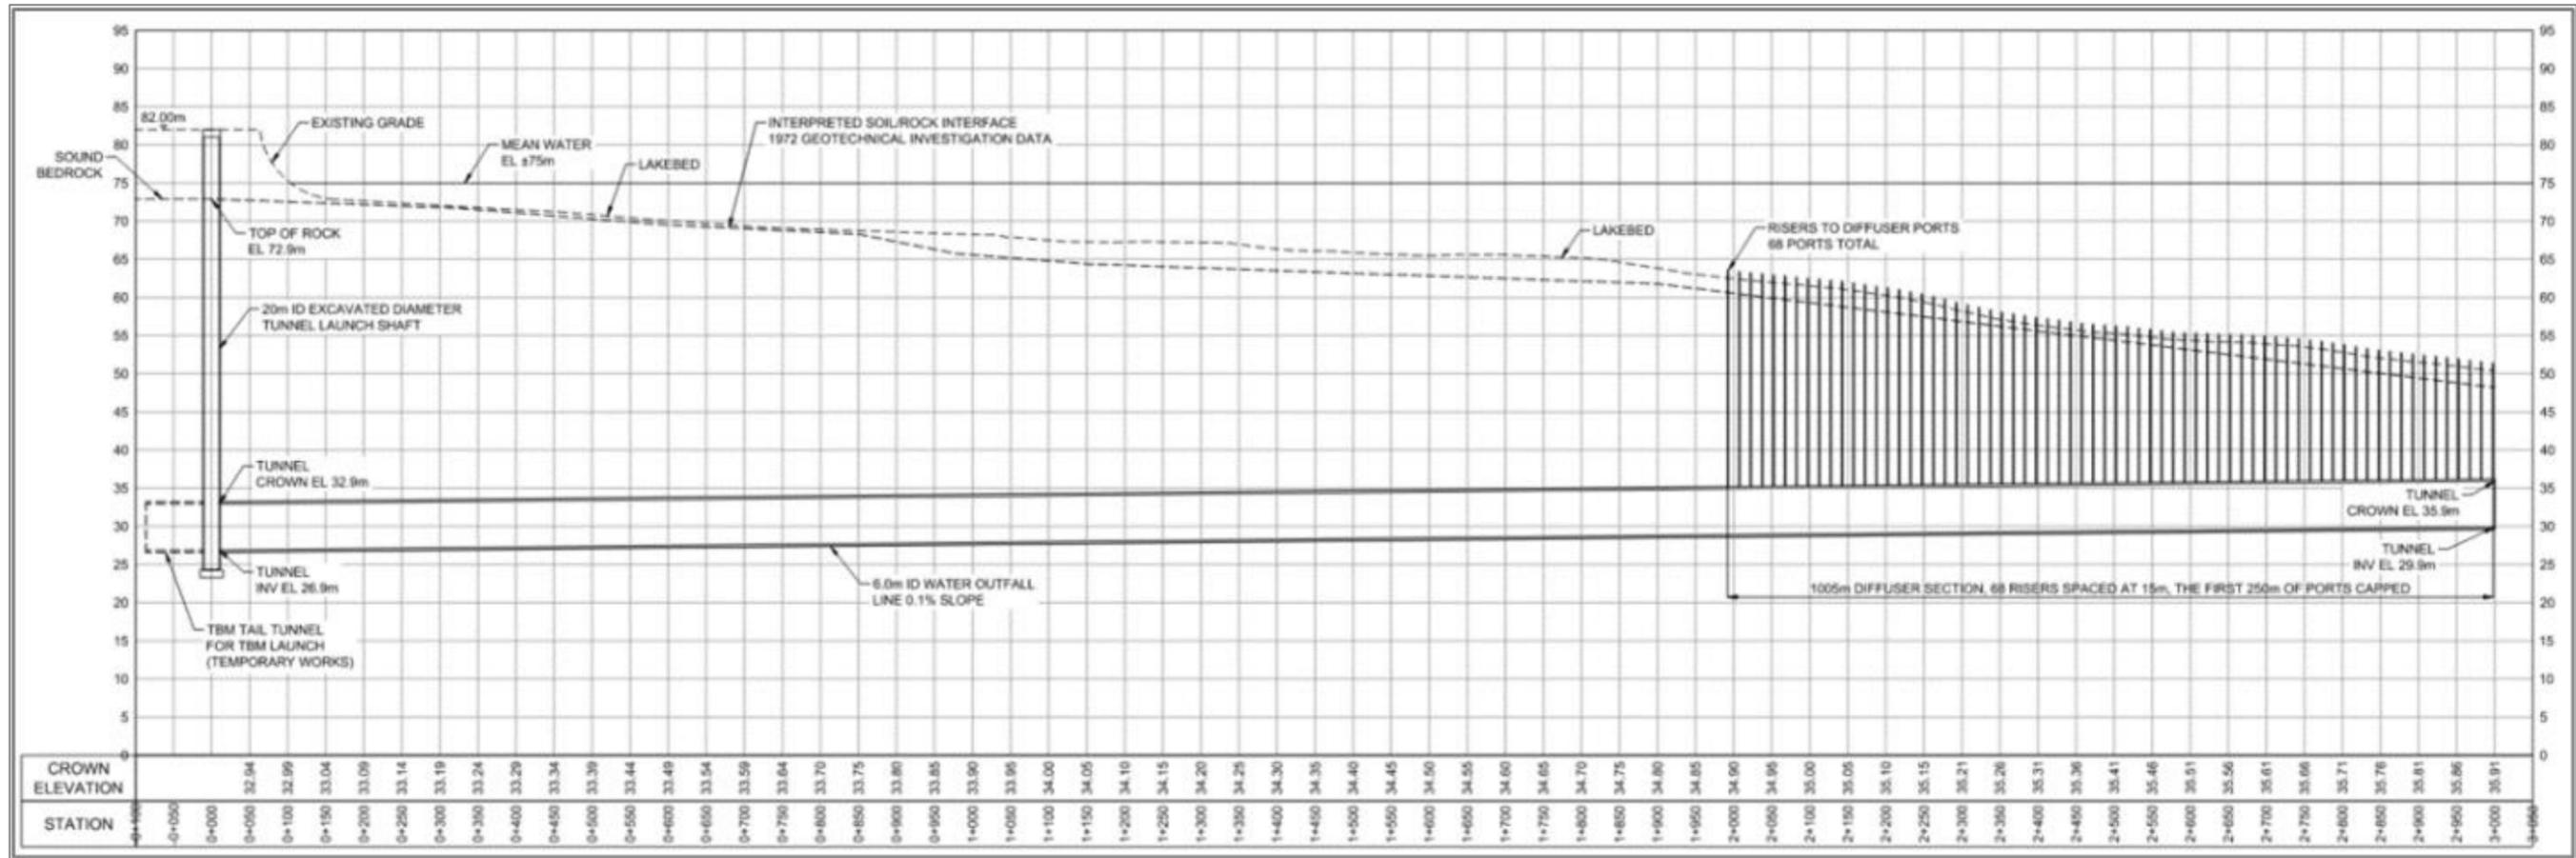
Recommended Outfall Tunnel Alignment - Profile View
